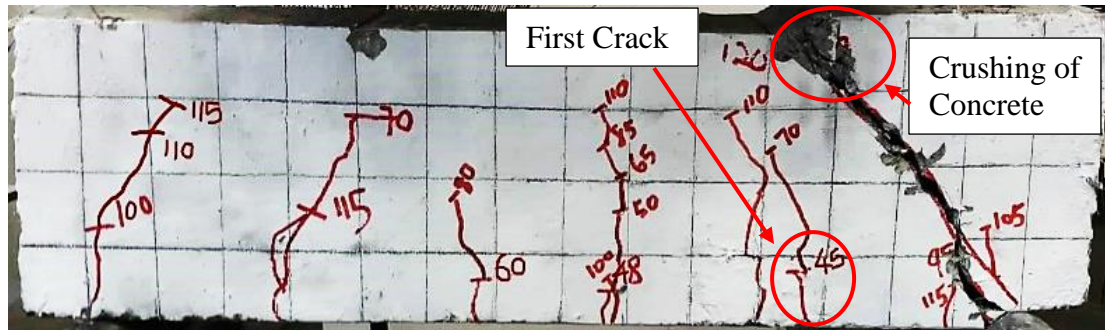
First Crack and Crushing of SFRC-0.7 Beam
